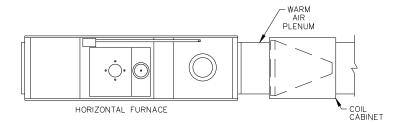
An acceptable location for the air conditioner evaporator coil when used with a horizontal furnace.
